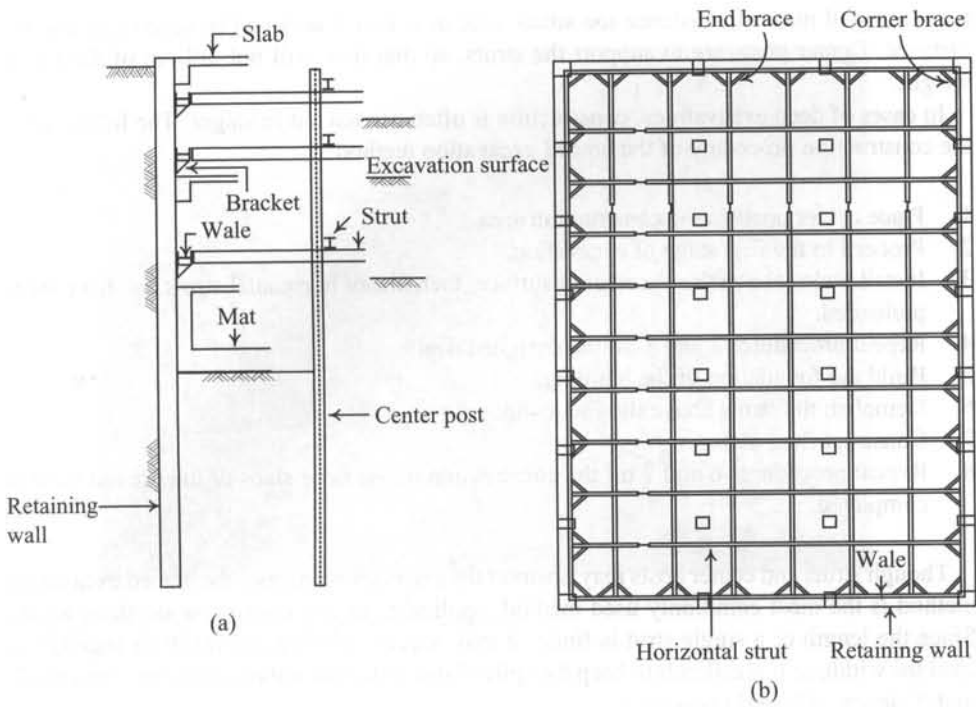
Braced excavation method: (a) profile and (b) plan.
